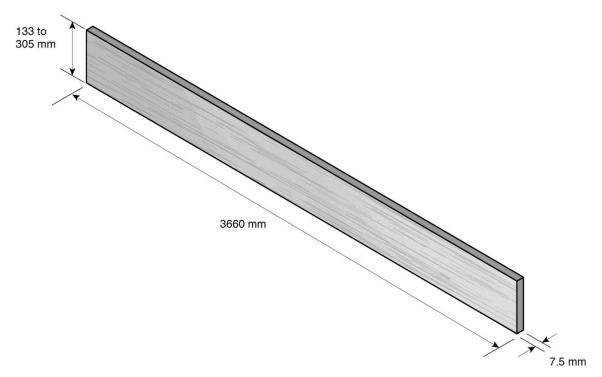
"HardiePlank® HZ5™ Lap Siding"
